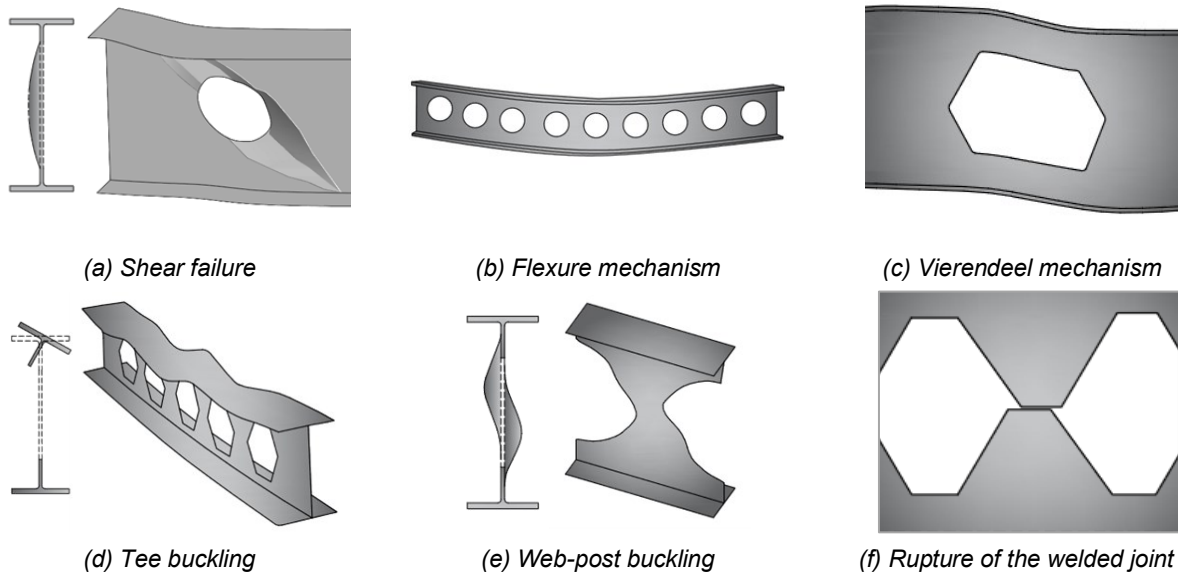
Local failure modes of beams with web openings under bending (adapted from [36])
